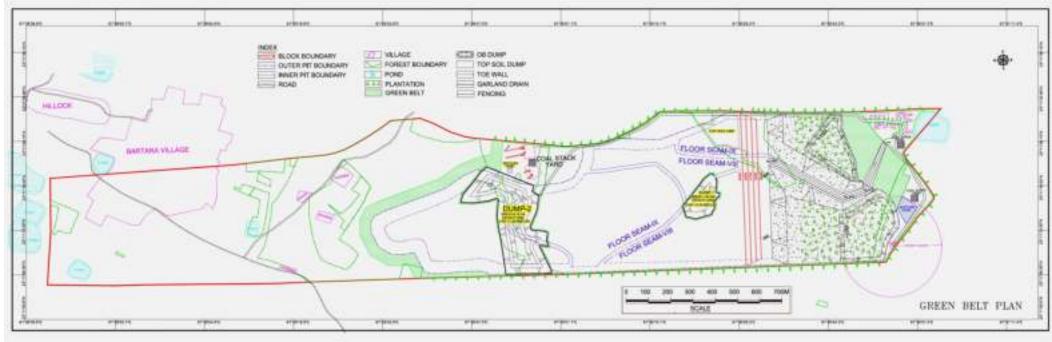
MINE STAGE AT THE CONCEPTUAL STAGE SHOWING PROPOSED PLANTATION
